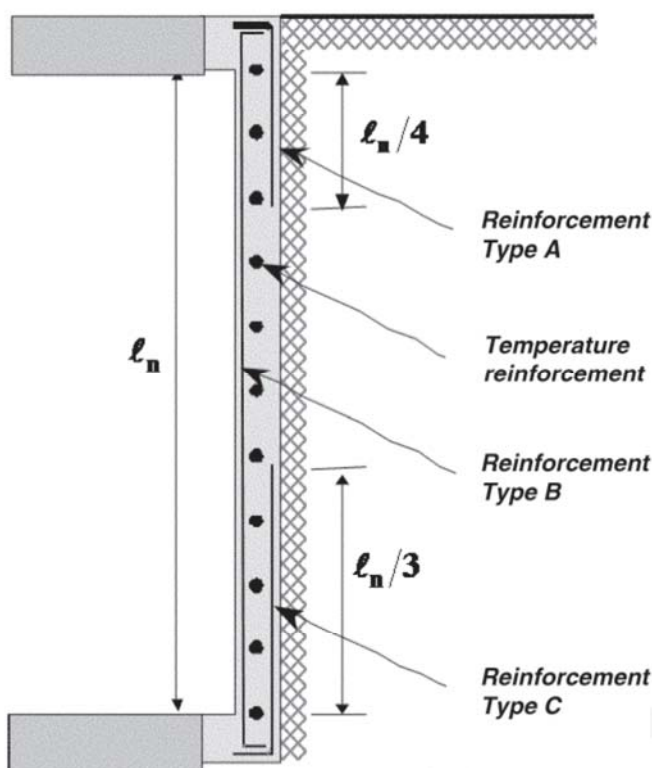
Design moments and reinforcement for basement walls.
